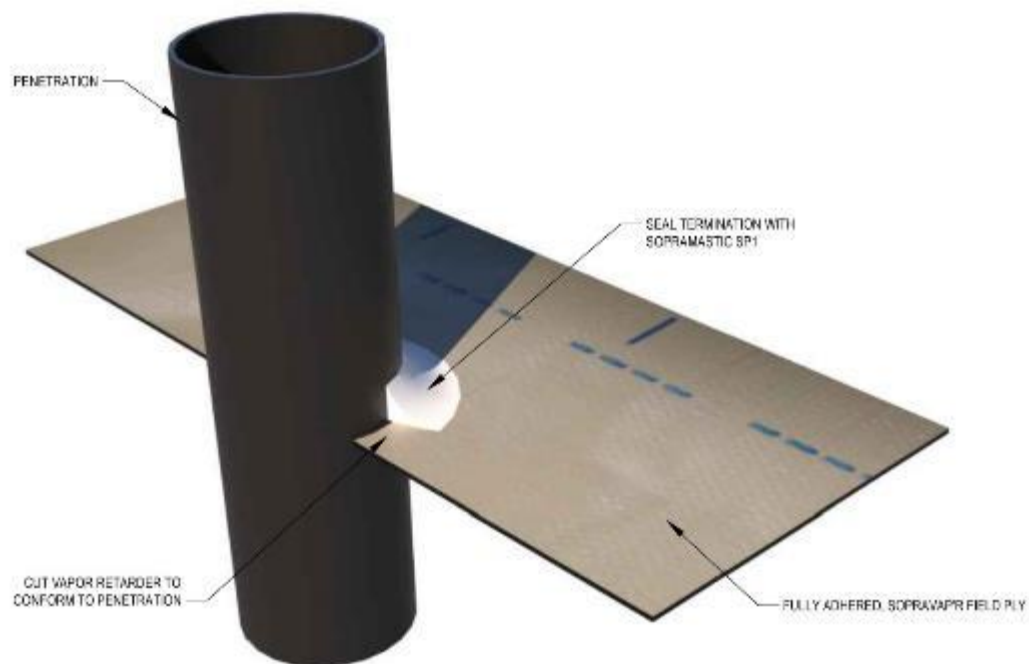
Fully Adhered, Self-Adhesive SOPRAVAP'R at Penetration
